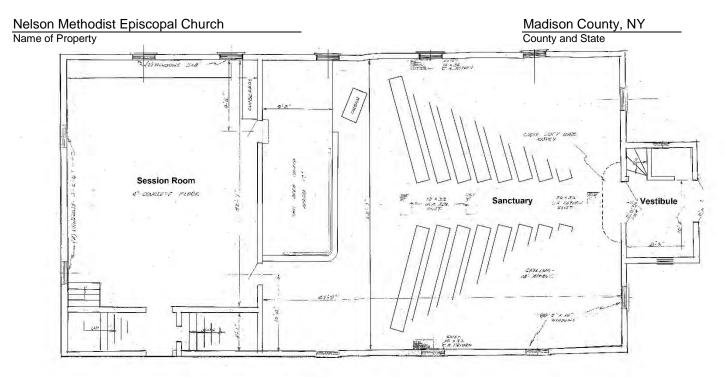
Mid-twentieth century floor plan. (Nelson United Methodist Church)
